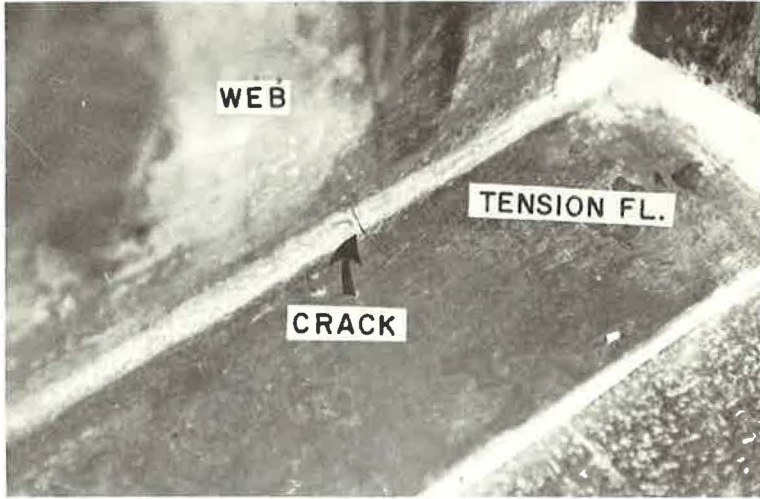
Crack initiating at discontinuity in the web-to-tension flange fillet weld.
